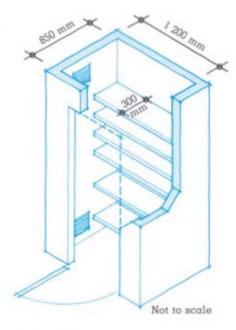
Recommended internal dimensions for a food pantry in a 3-bedroom dwelling
